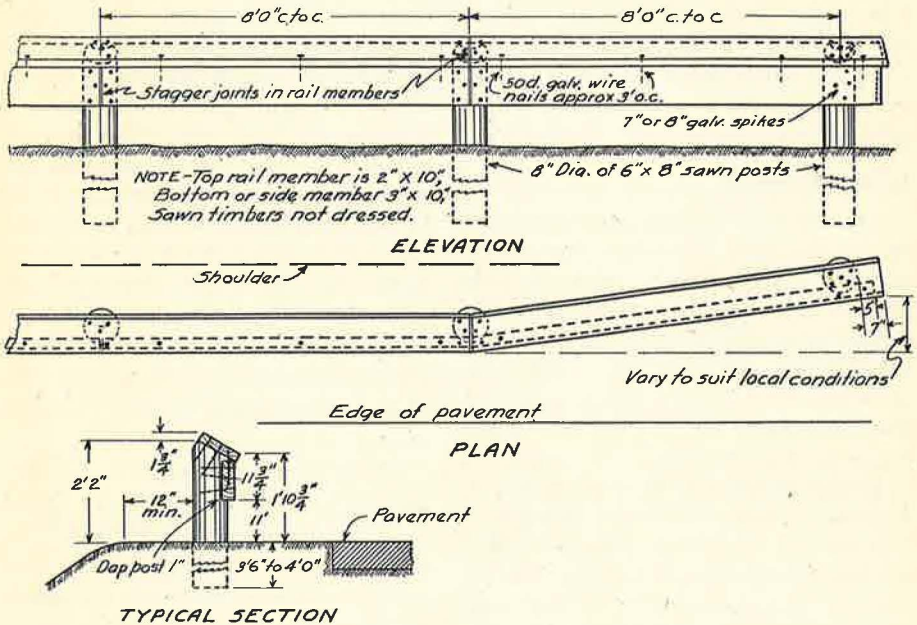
Details of Low Type Double Rail Timber Guard
